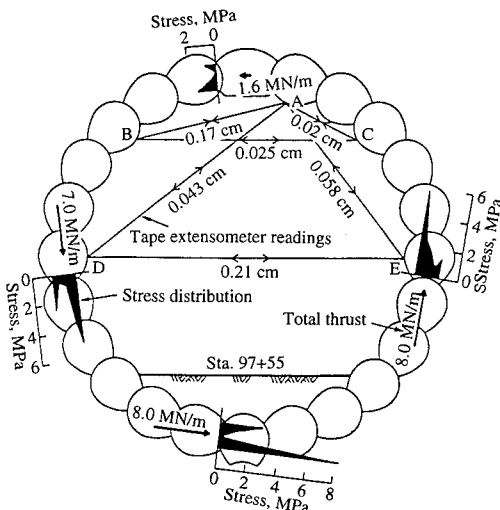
In situ data at Mt. Baker Ridge Tunnel
